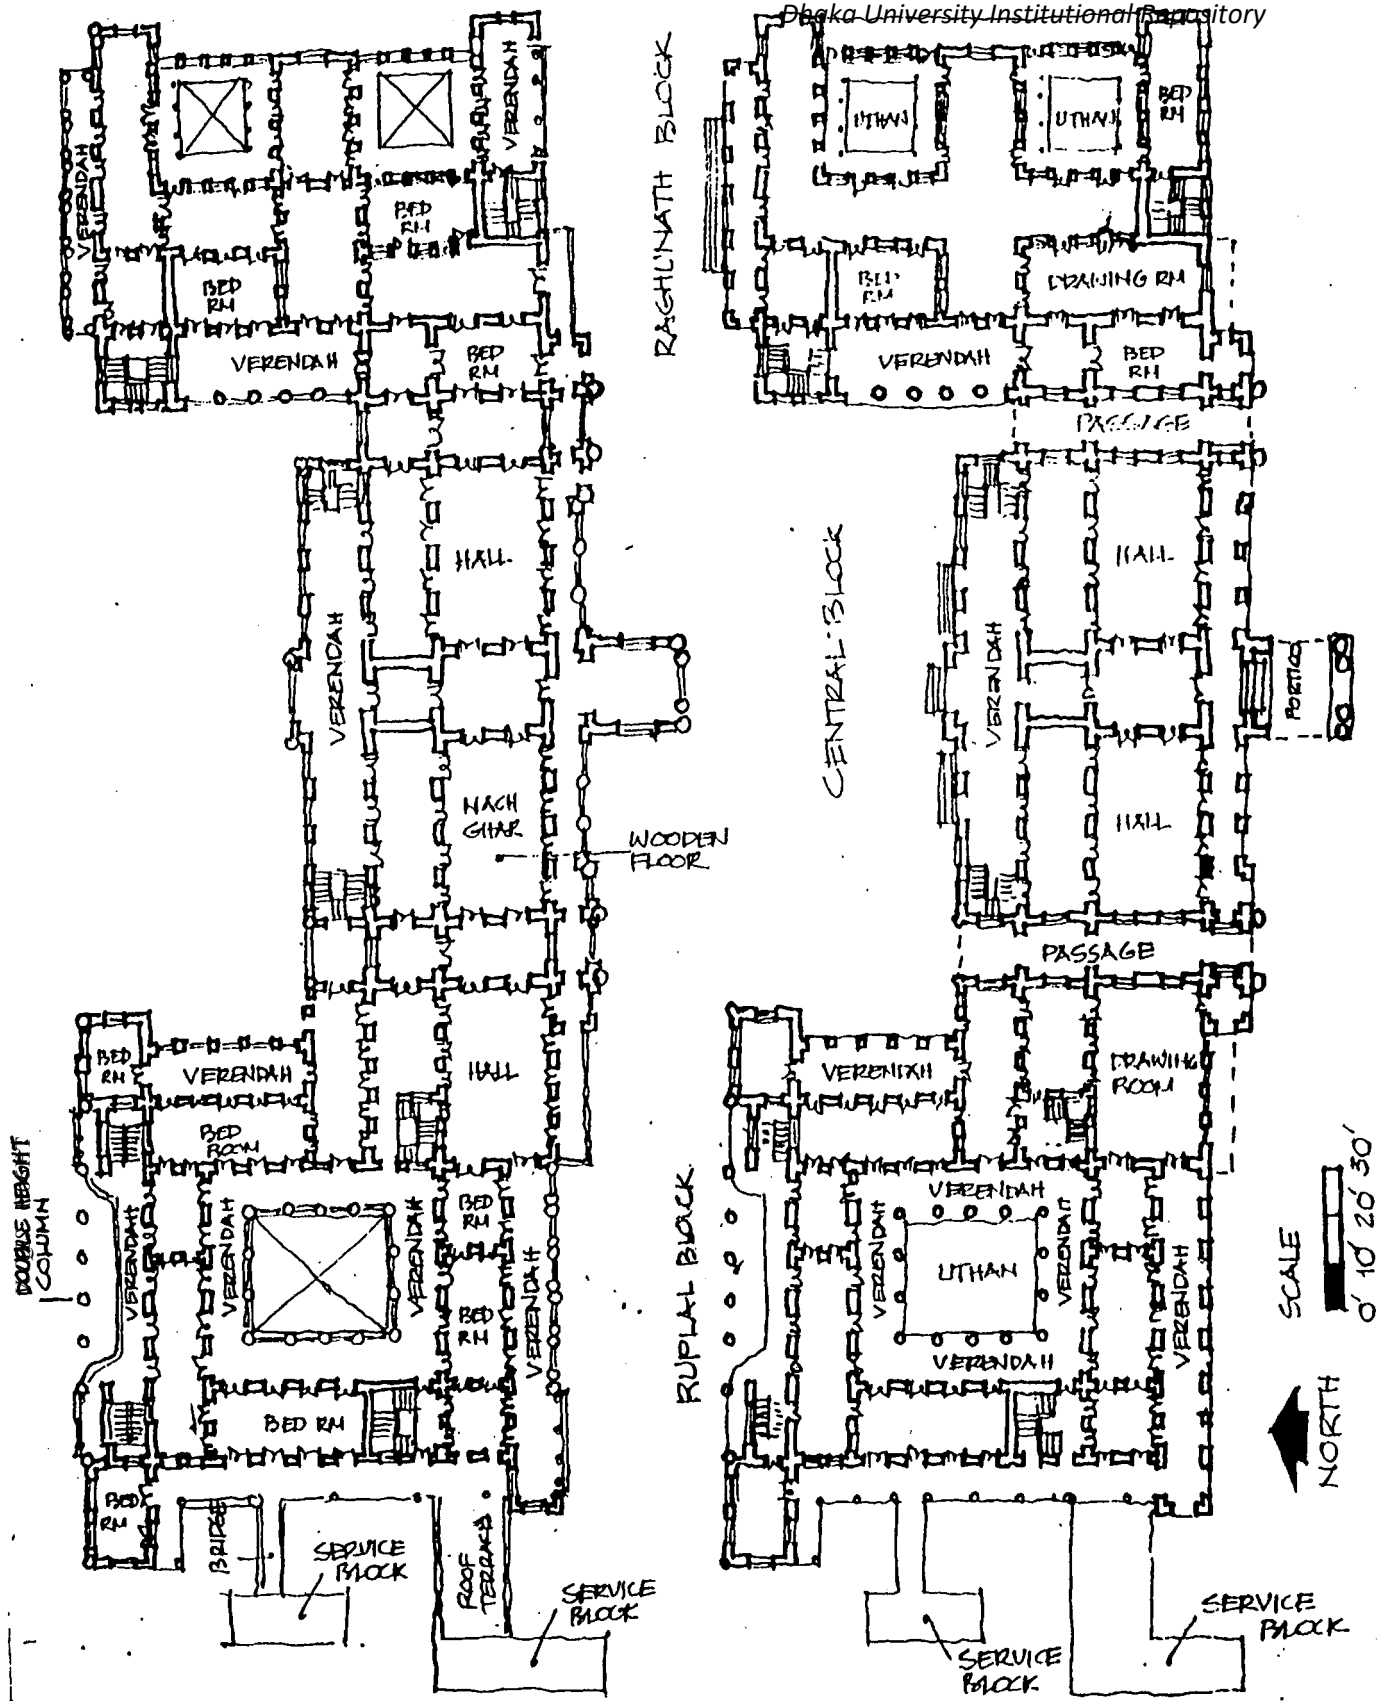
First floor plan, Ruplal house, Dhaka
